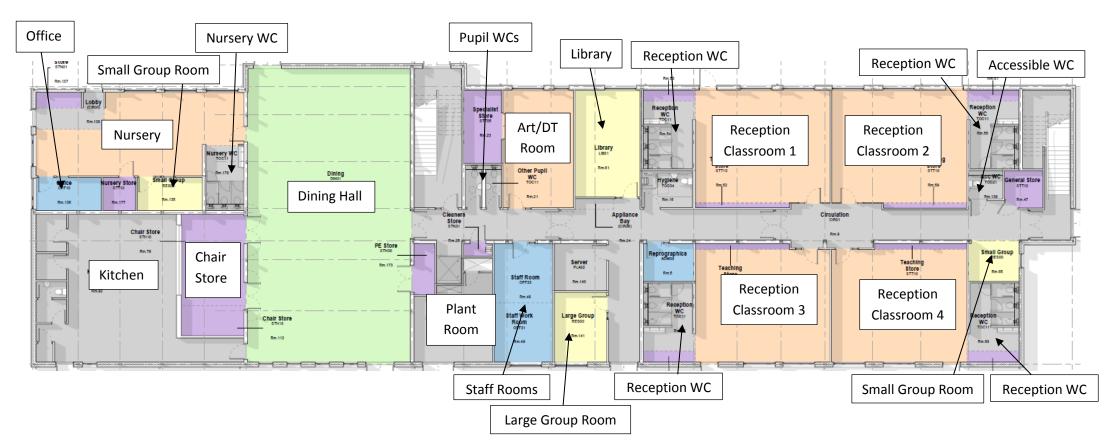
Proposed Ground Floor Internal Layout Plans
